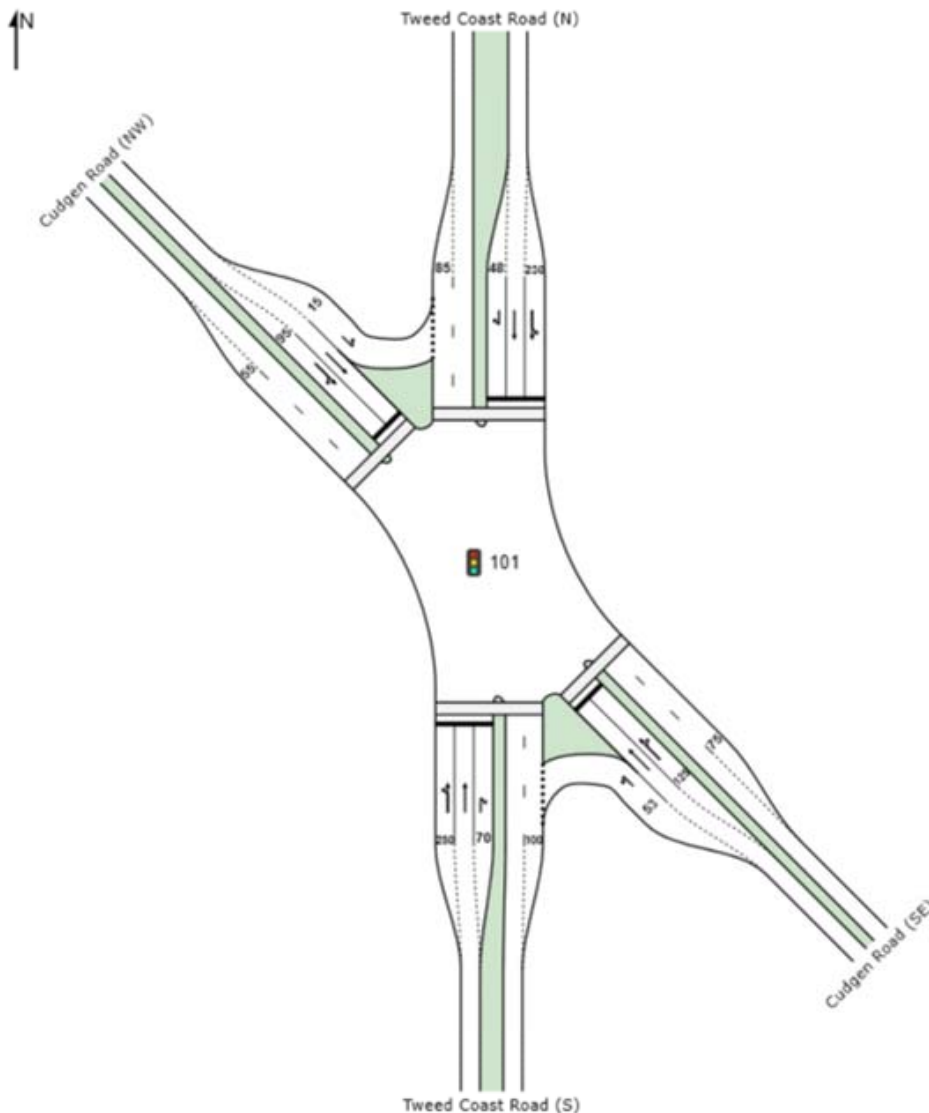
Tweed Coast Road / Cudgen Road SIDRA Intersection Layout - Existing
